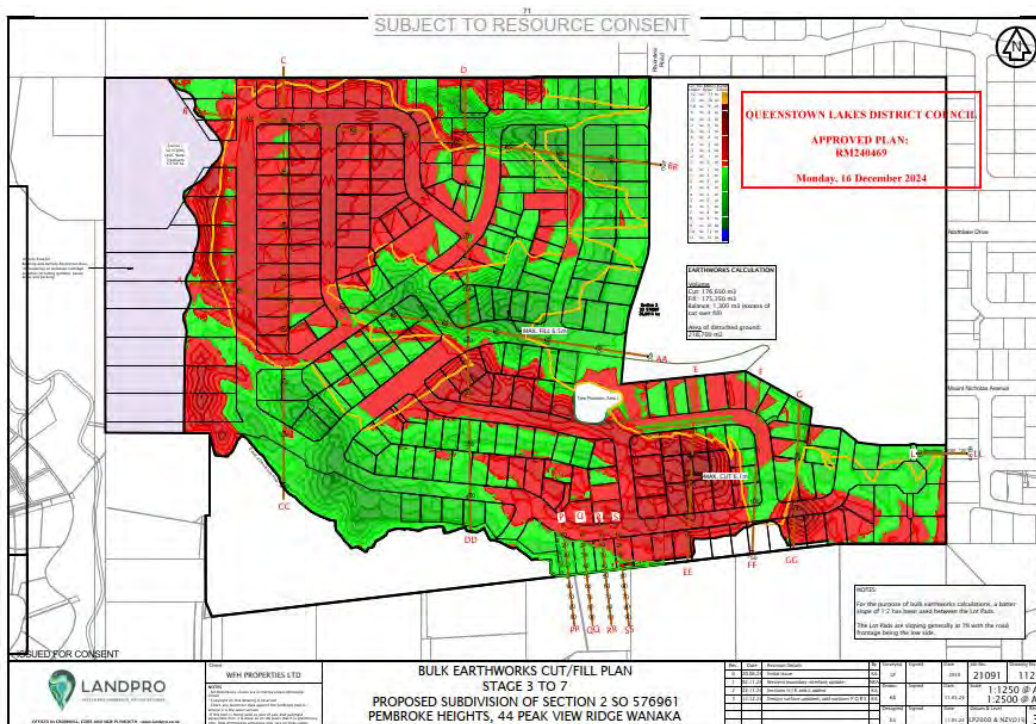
Stage 3-7 Bulk Earthworks Plan – Approved Plan RM240469
